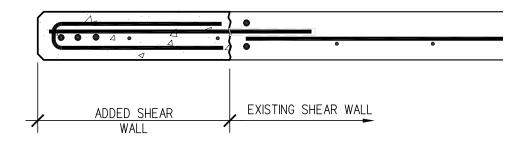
D: NEW SHEAR WALL AT EXIST. WALL
